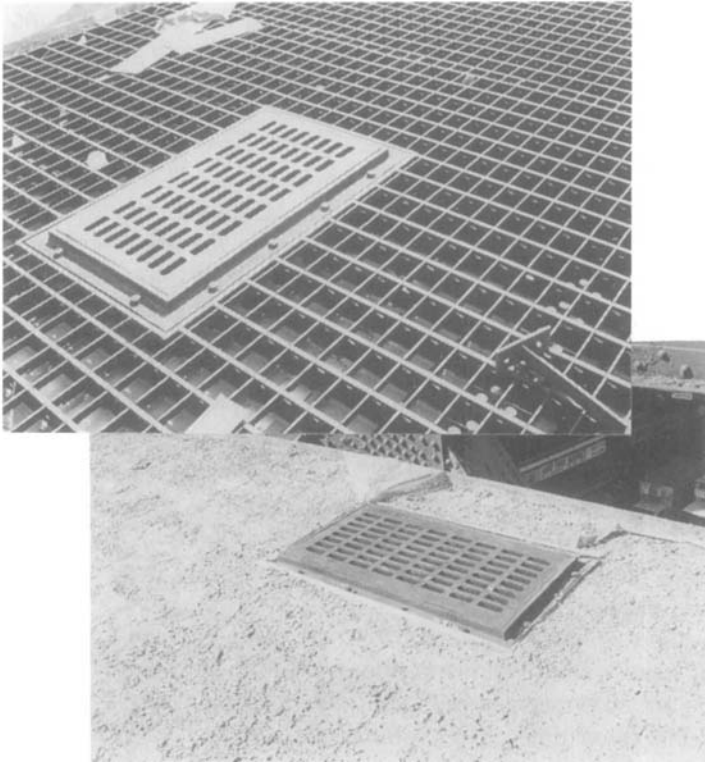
, a & b Concrete filled the steel grid deck on New York City's Manhattan Bridge and was later topped with an overlay.
